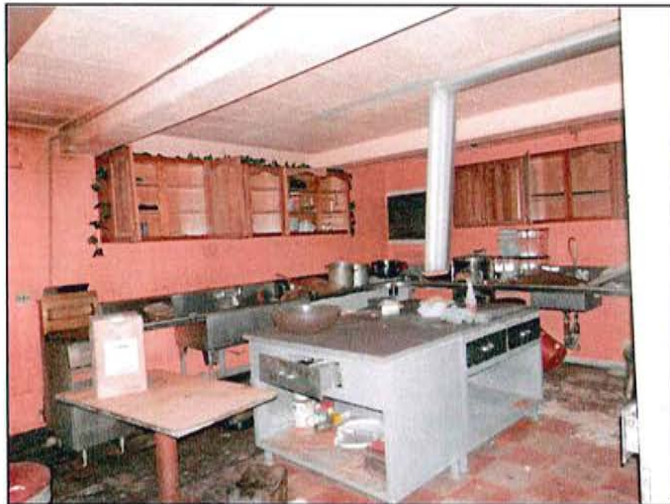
2<sup>nd</sup> Floor room, west side of structure
